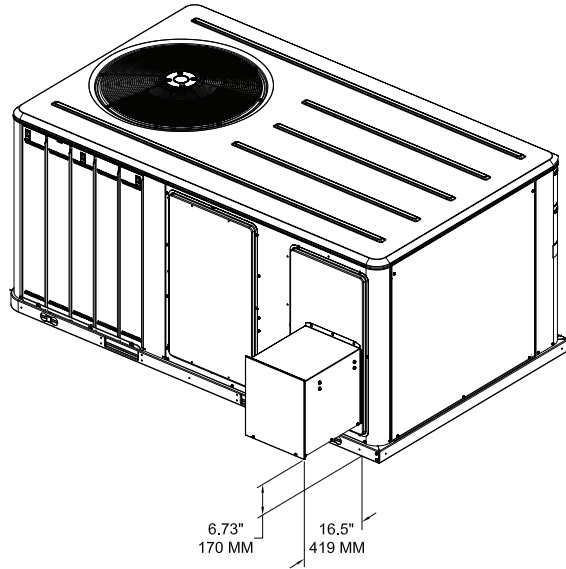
Heat pumps - 5-6 tons - economizer, manual or motorized fresh air damper
